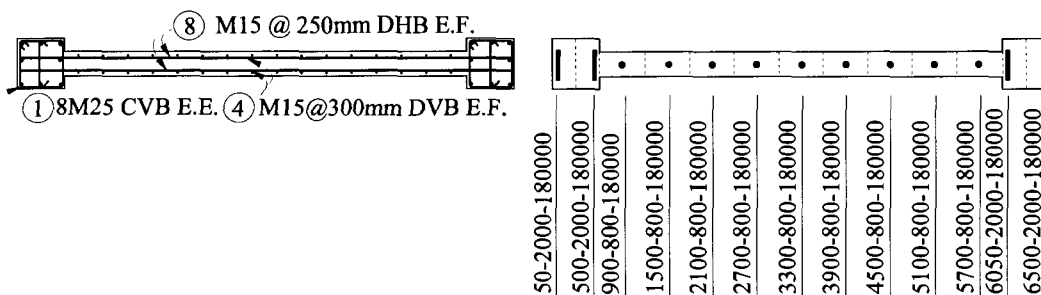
Modeling of shear wall sections for B18 located in Vancouver
